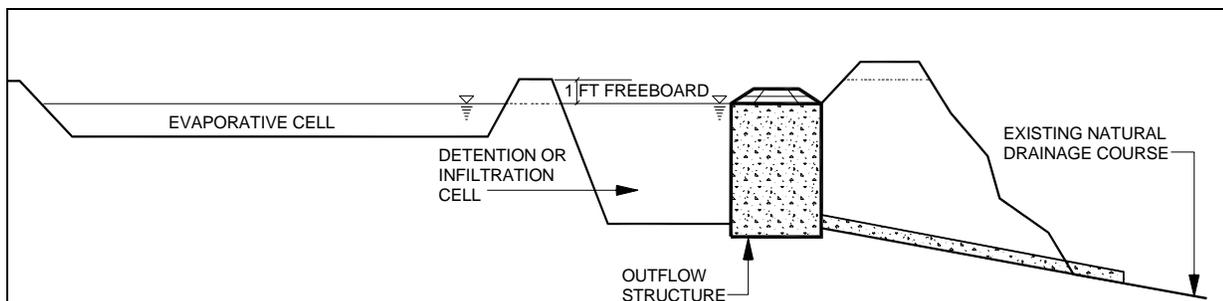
Separated Evaporative/Detention Facility Cross-Section
